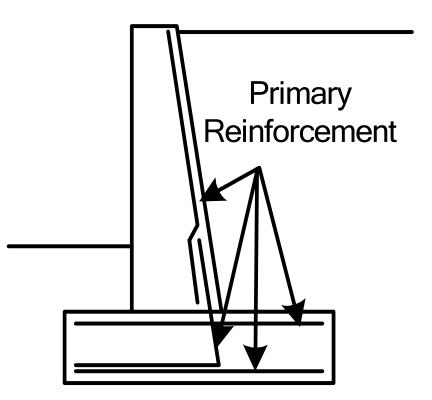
Primary Reinforcement in Concrete Cantilever Wingwall
